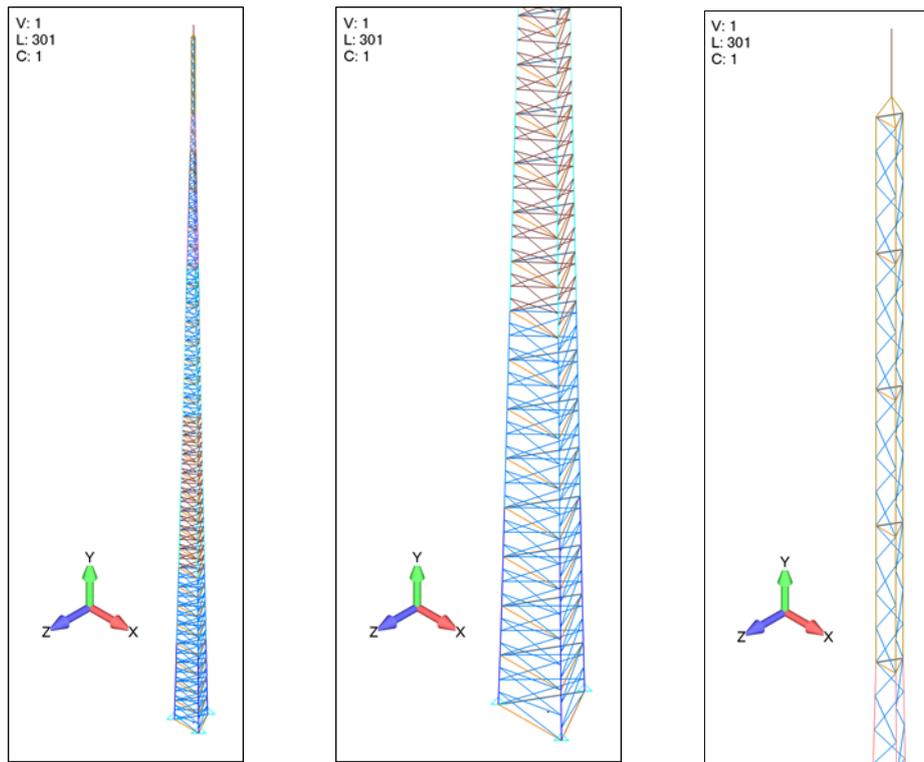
Tower geometry; a) global view; b) bottom part - detail; c) top part - detail
